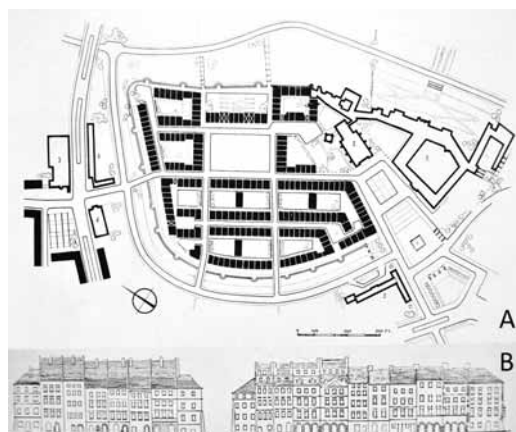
Project of reconstruction of the Old Town in Warsaw: A) Plan, B) Façades of Old Town tenement houses, designed by Stanisław łańcucki (1945) (source: [2, p. 188])
